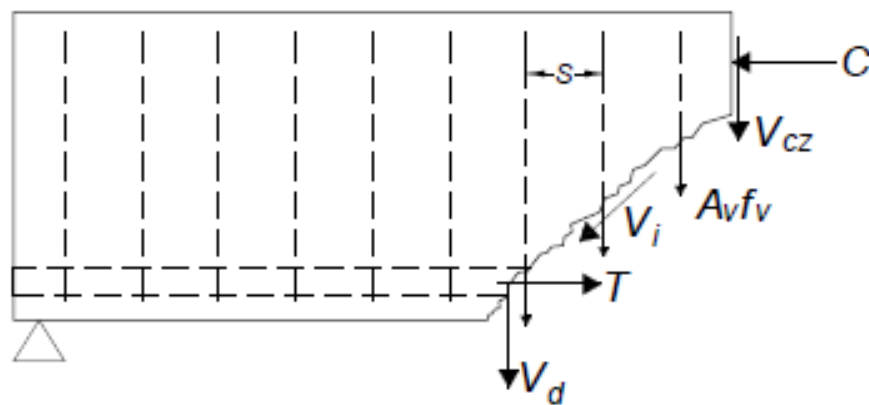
Forces at a diagonal crack in a reinforced concrete beam with shear reinforcement (figure after (Darwin et al. 2016))
